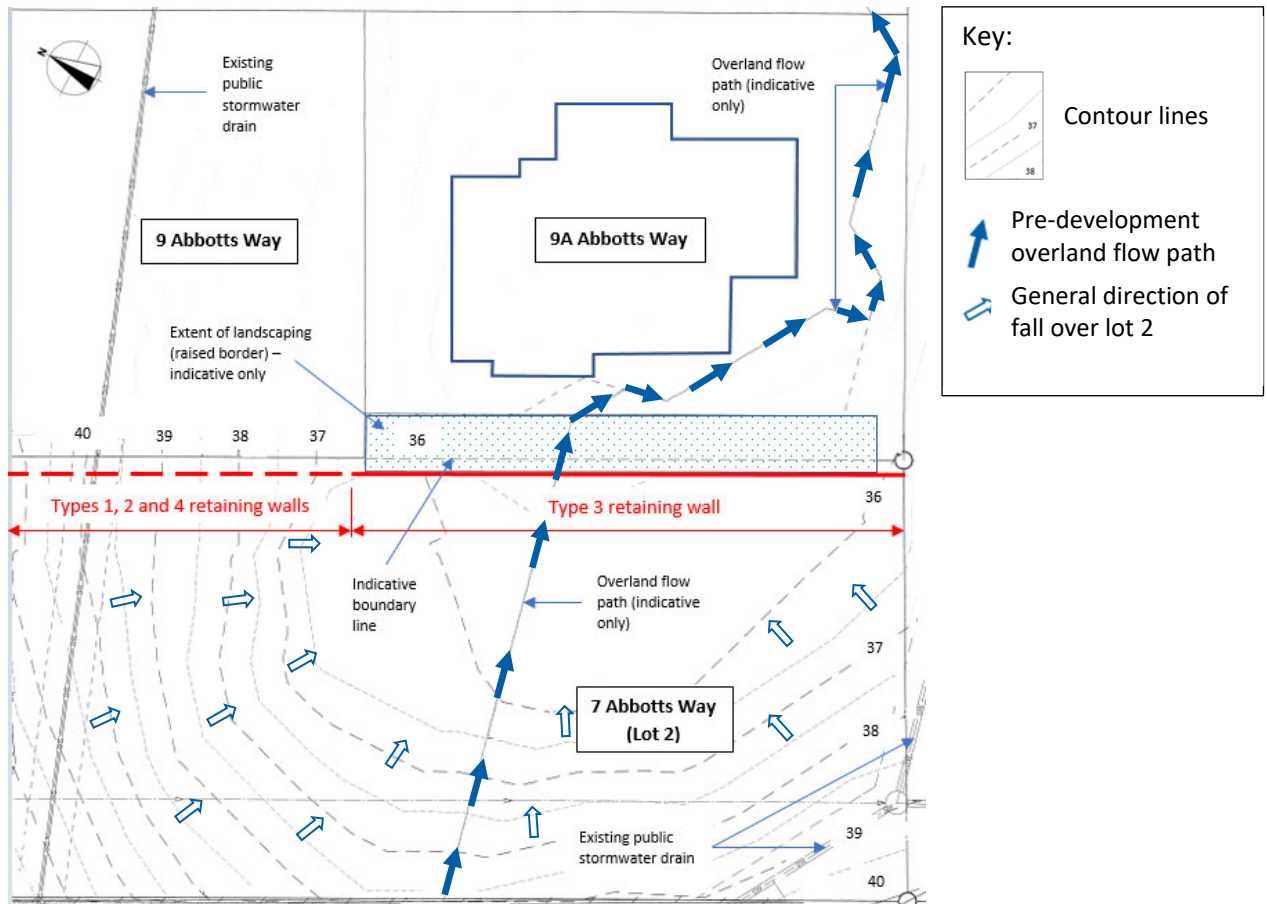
Site plan – pre-development overland flow path¹⁶ (not to scale).
